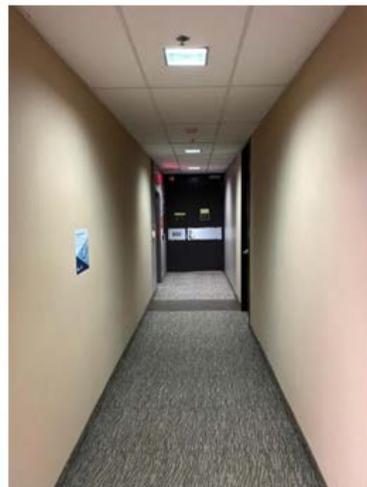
Picture from inside loading dock area Looking towards Freight elevator door
